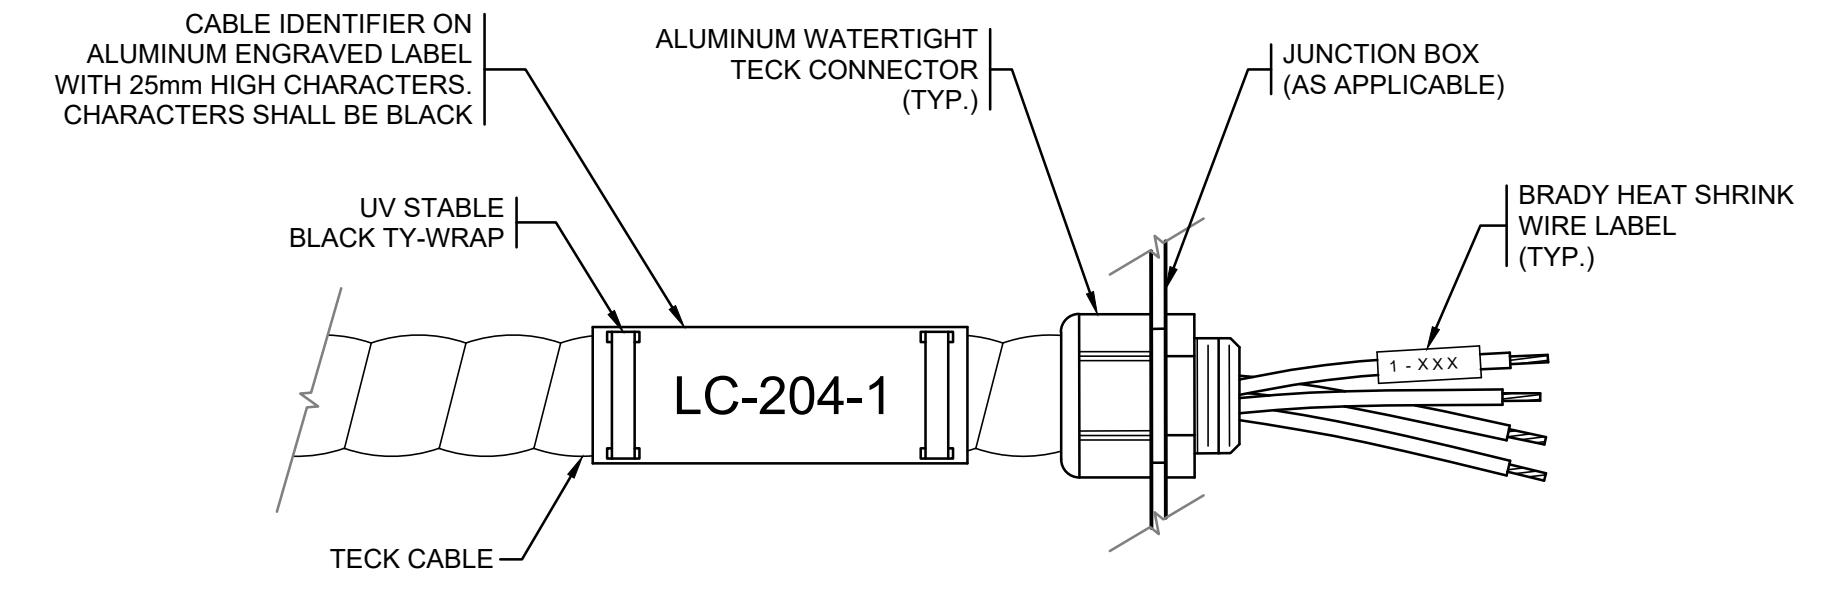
TYPICAL DISCRETE CONTROL FIELD WIRING TERMINATION METHOD
